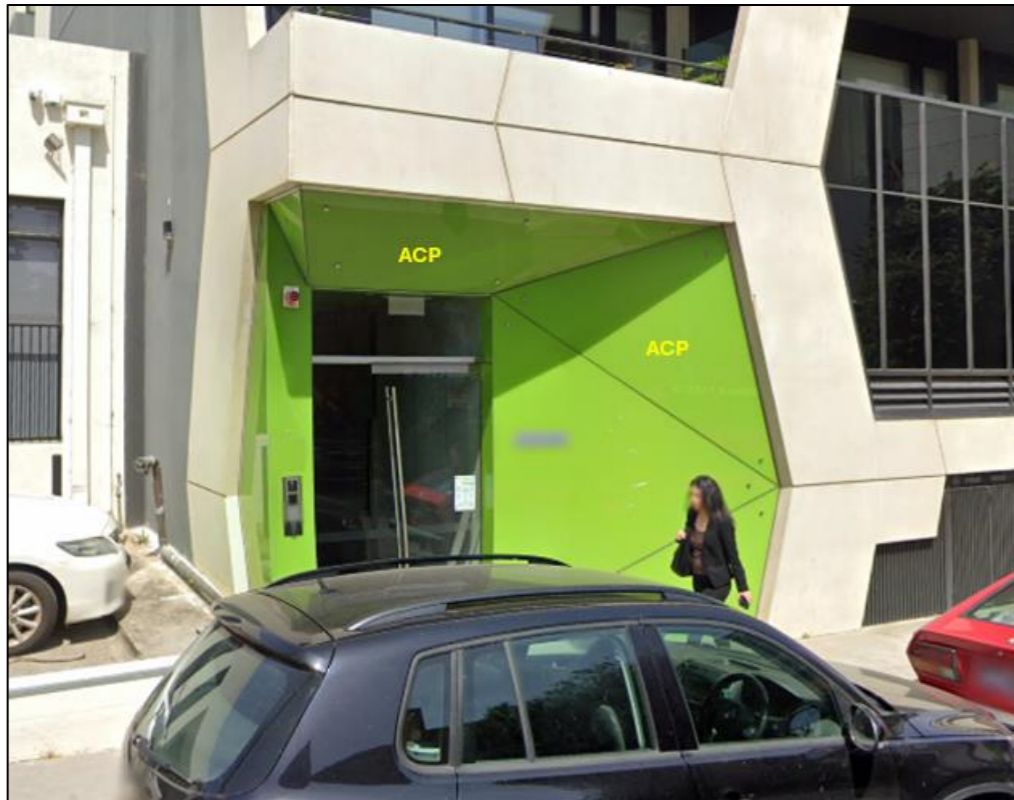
ACP cladding directly above and to both sides of the exit door. Sprinkler protection to SOUs.
